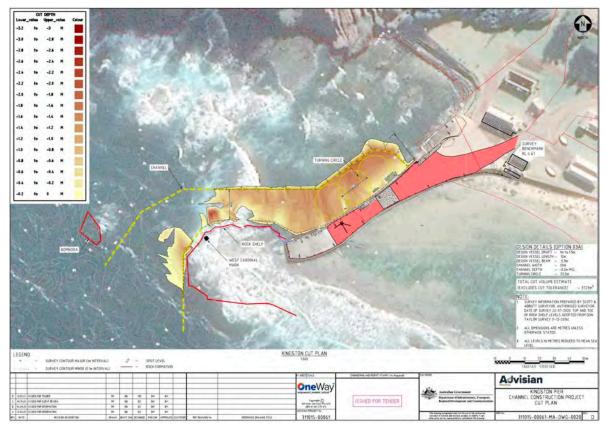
Cut plan (Option 3A) Kingston Pier Channel Construction Project. Plan supplied by Advisian.
